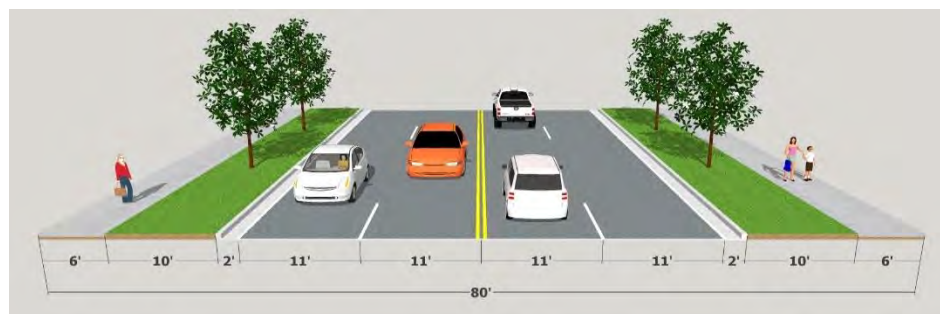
4-Lane Alternative – Street Trees & Sidewalk (East of 10th Street)
